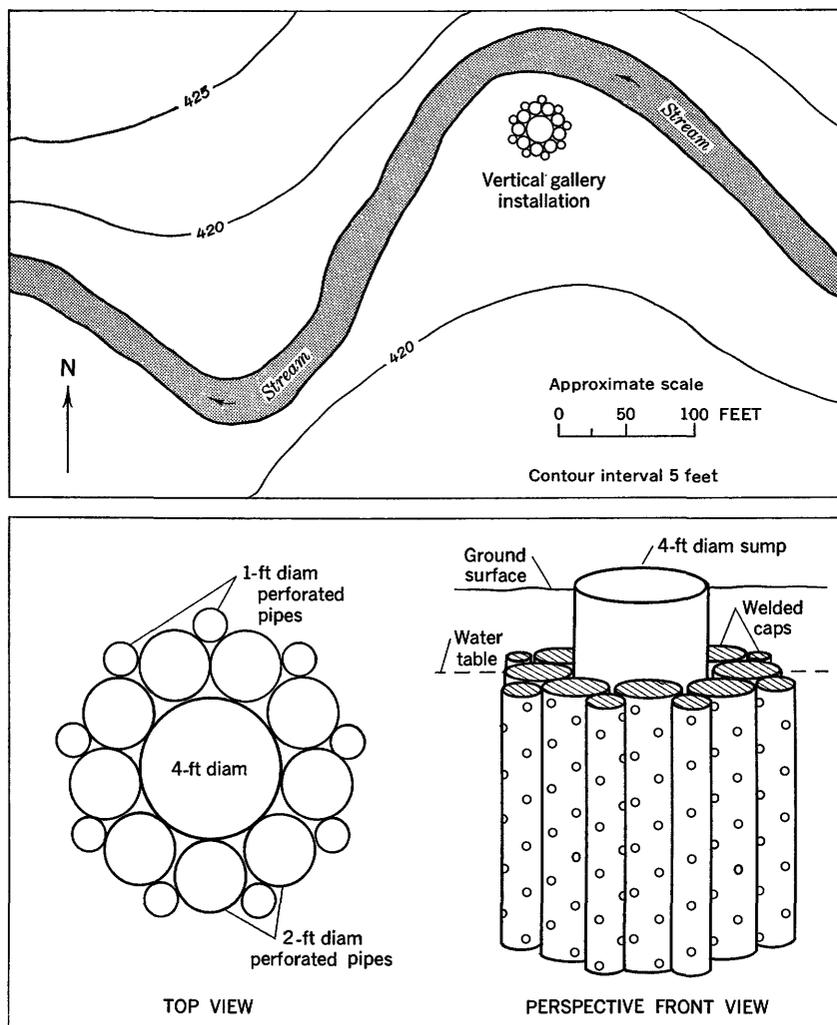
Sketch map of vertical gallery installation and diagrammatic section showing top and front view of the installation.
